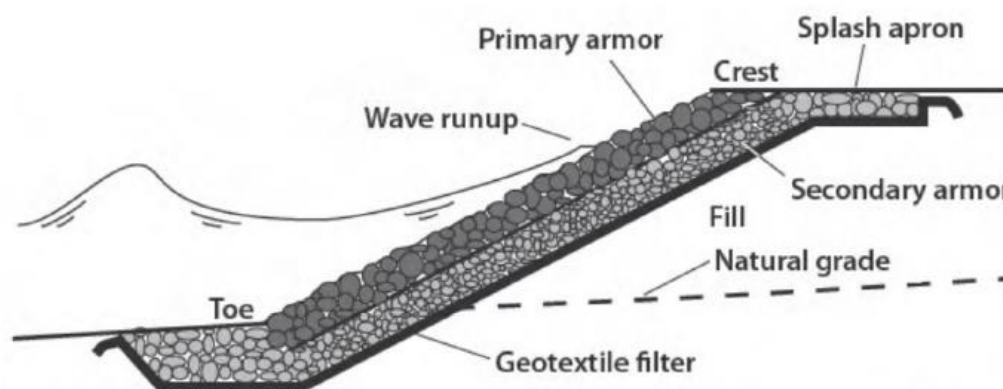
Cross section of a typical revetment (Depina, Guégan and Sinitsyn 2016)
